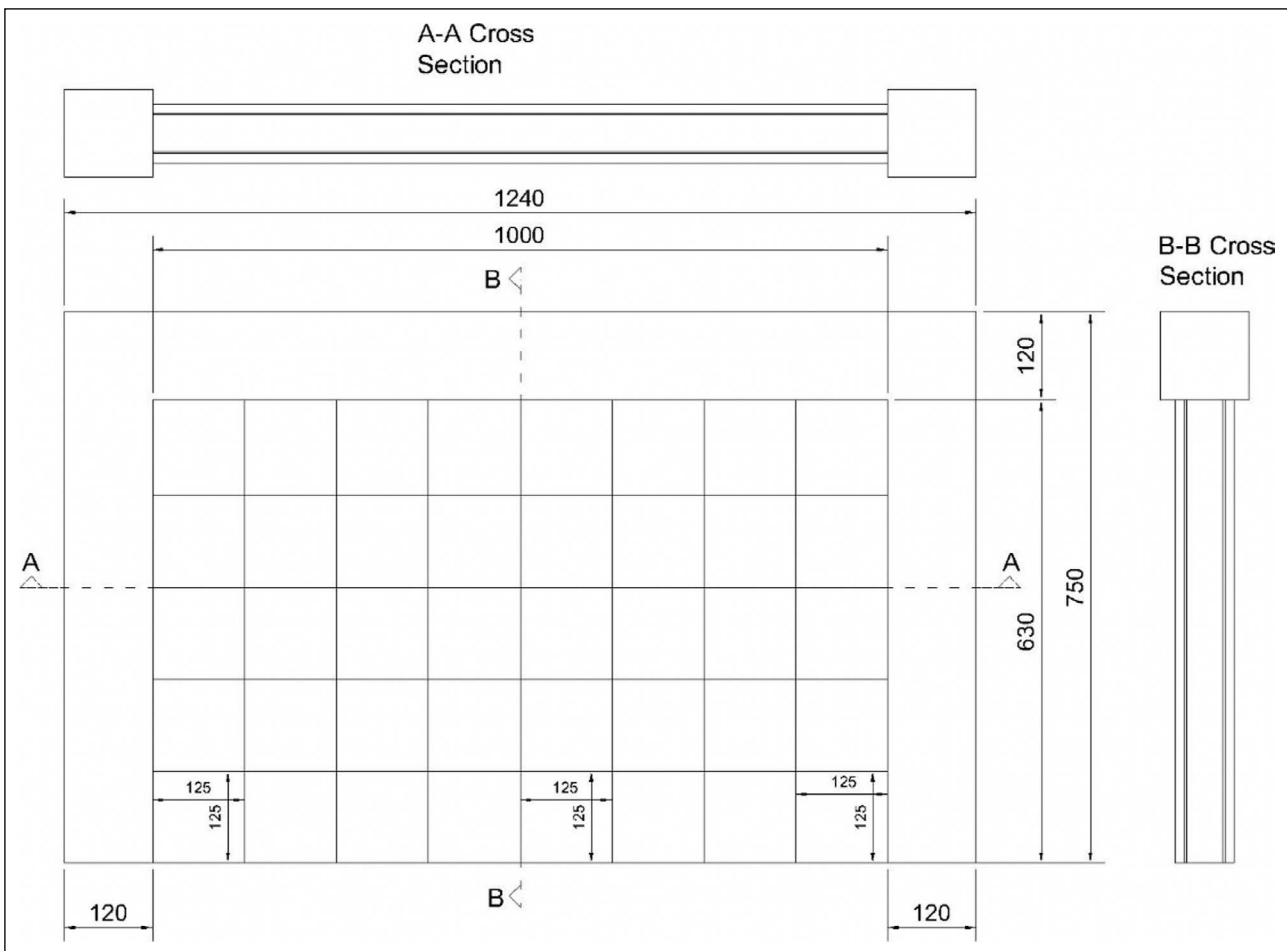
Proposed retrofitting of infill wall inside RC frame.
